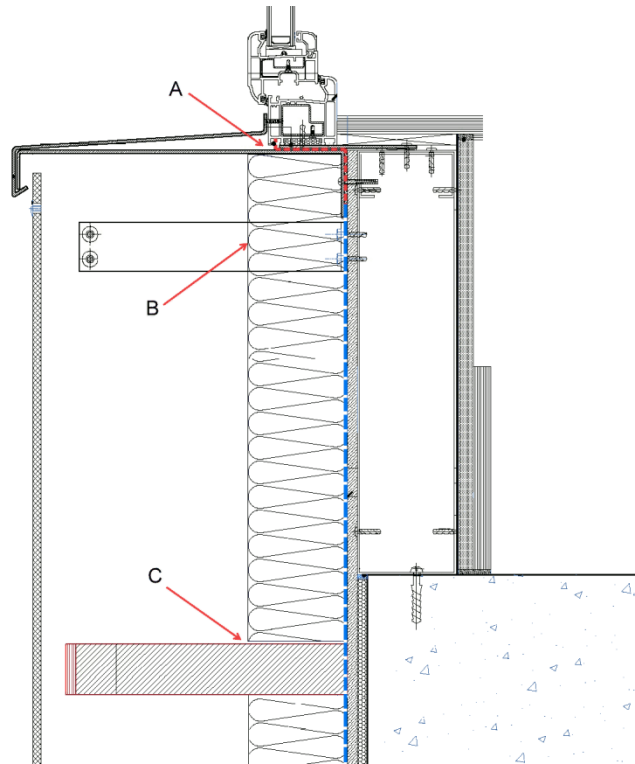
Window sill interface with rainscreen bracket and cavity barrier – alternative configuration
